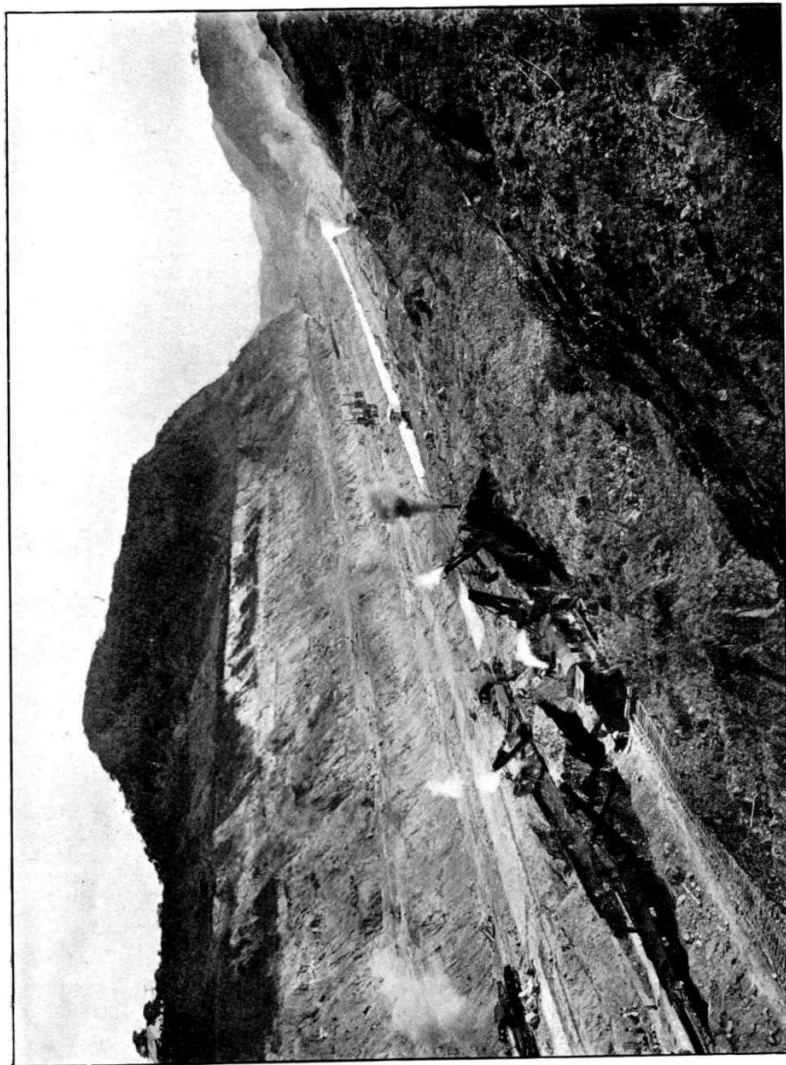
Panama Canal. Culebra Cutting. West Bank looking South, 1909.
